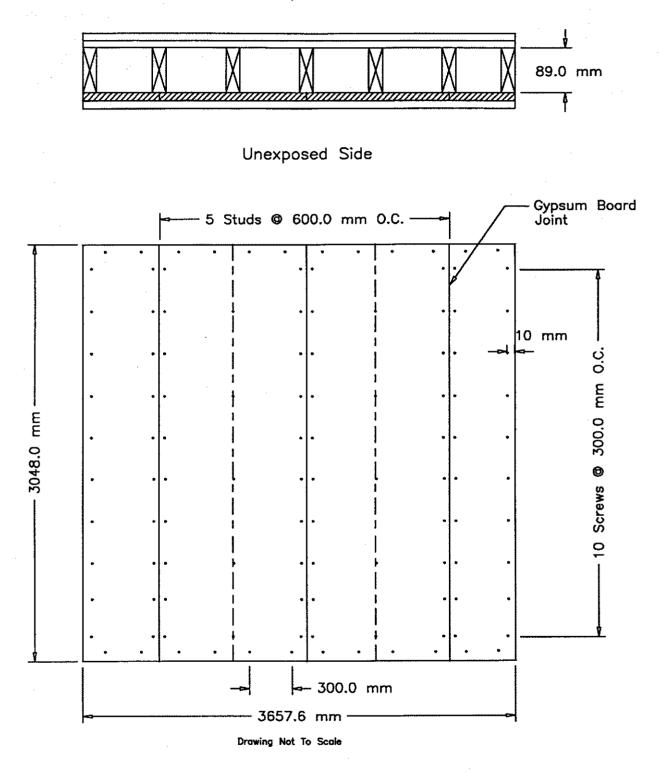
Screw Locations For Wood Stud (600 mm O.C.), 2x2 Gypsum Board Layers, Full-Scale Assembly, Base Layer Gypsum Board, Unexposed Face
